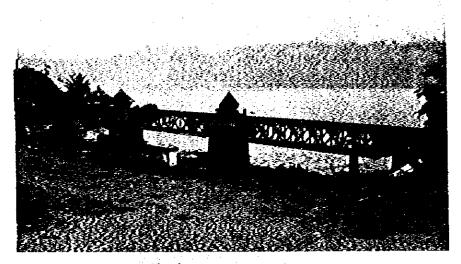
Truss deck bridge (HNO-14) Bridge number 329
